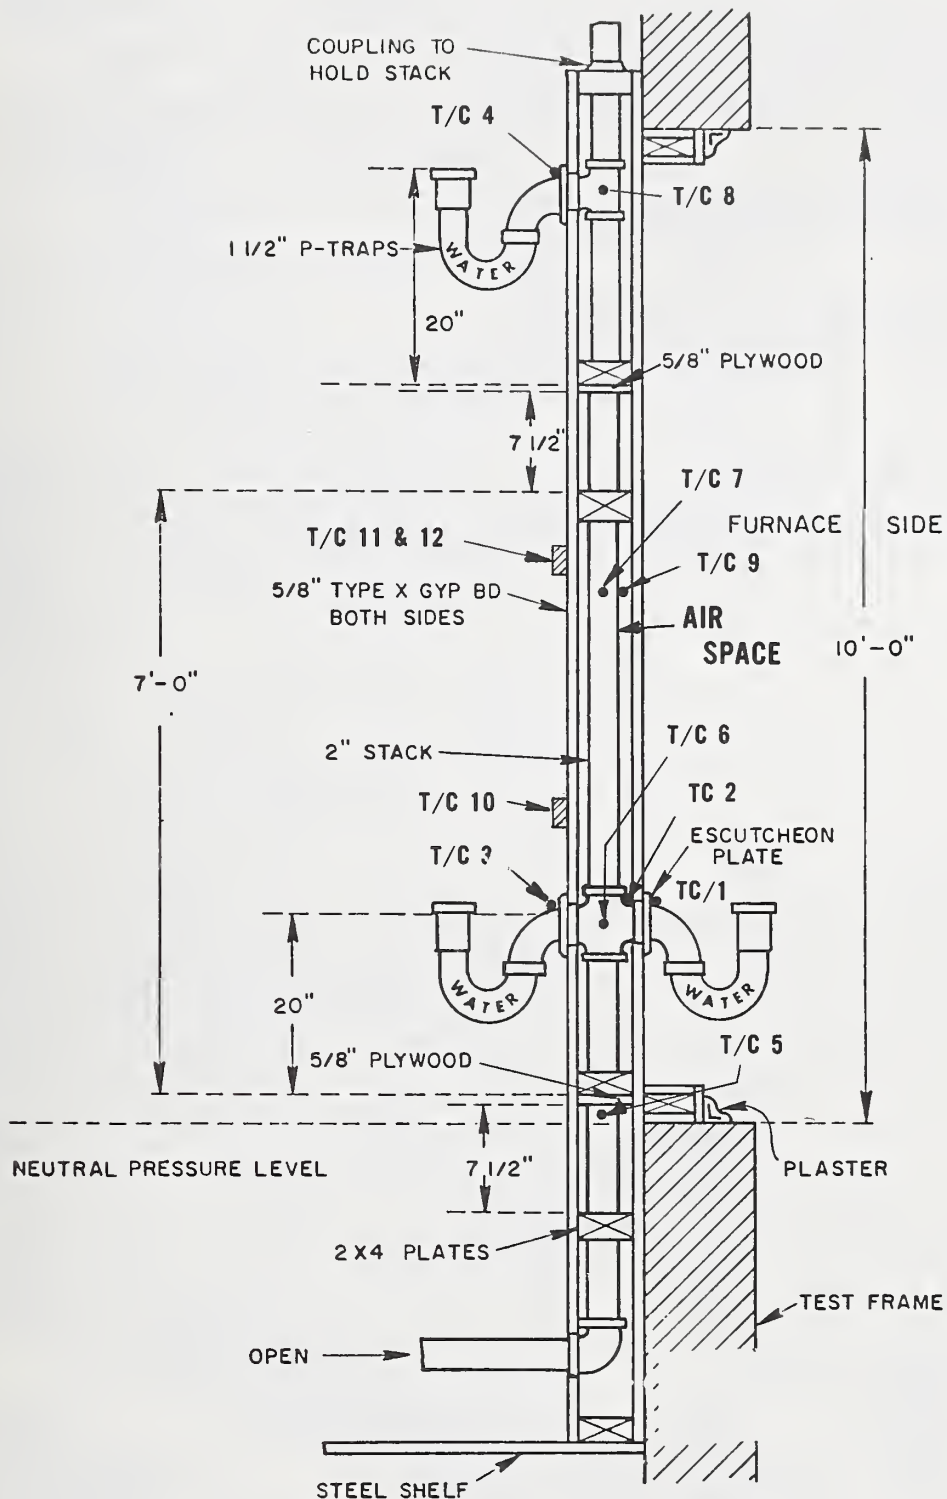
Cross section of wall showing DWV installation and thermocouple locations in test 3.
